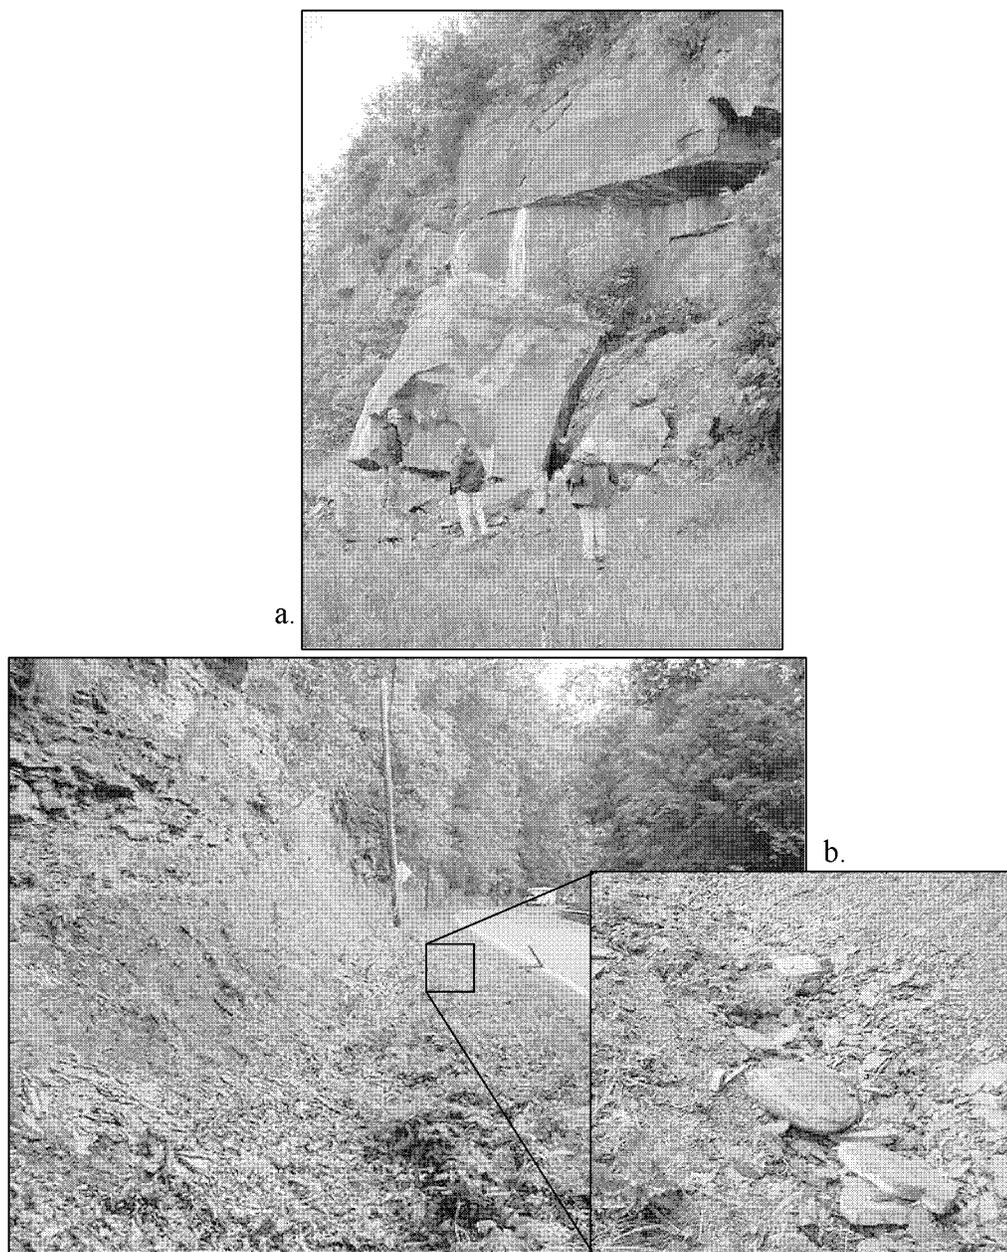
Effect of joint spacing on size of failure (a) large joint spacing promoting large block failures and (b) small joint spacing promoting development of small failures.
